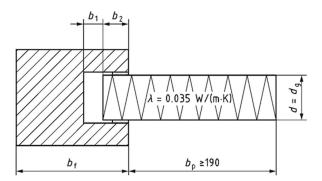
The view of frame and installed panel section in EN 10077-2 [65].
